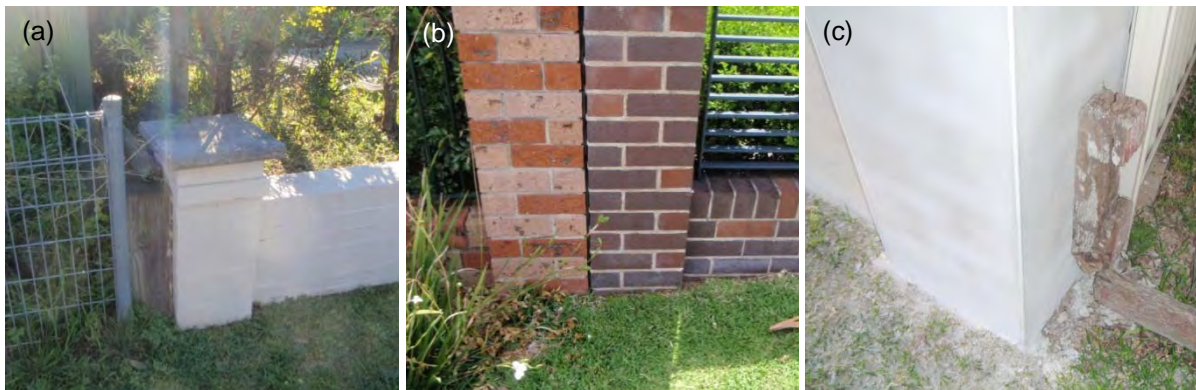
(a) Timber fence with brick pier abutting, (b) brick piers abutting at a side boundary, and (c) old post retained as new front and side fences are erected.
